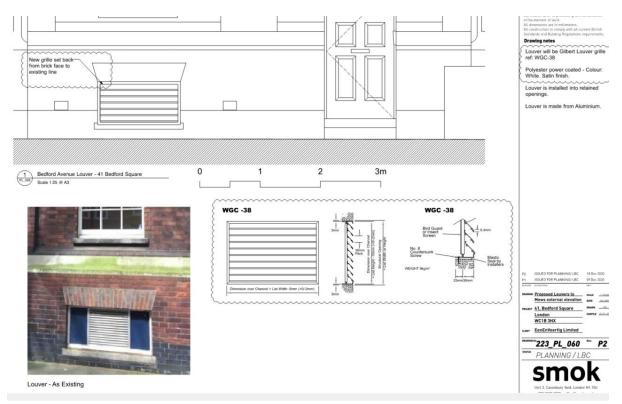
(above): As proposed ventilation louvre at lower ground floor level on the mews building at 11 Bedford Avenue
